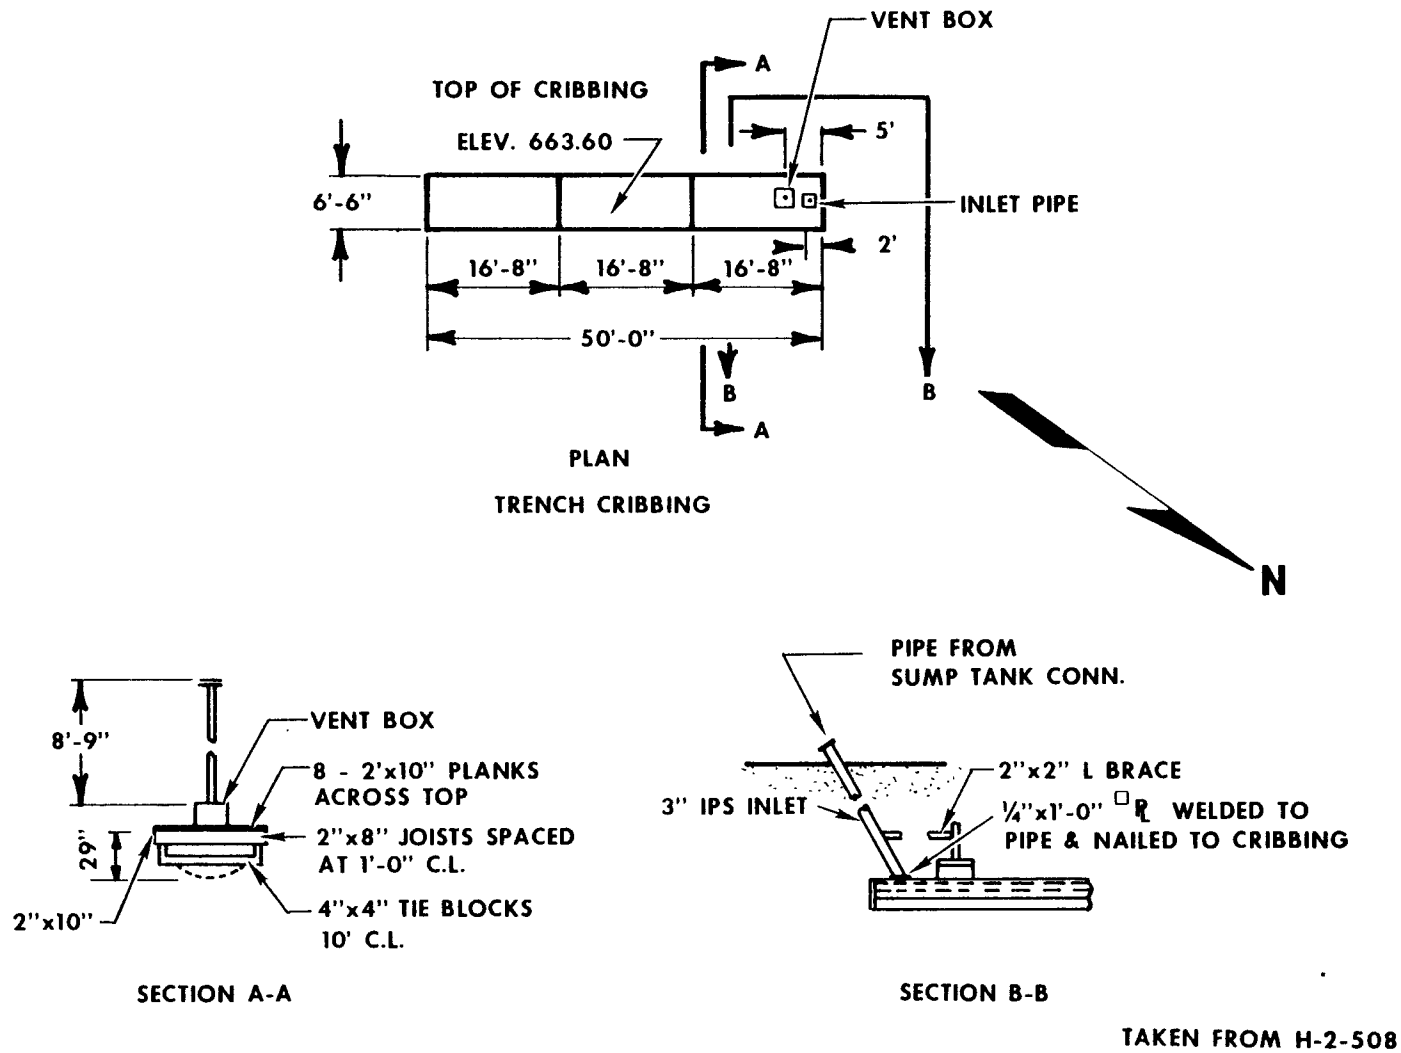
216-Z-6 Crib Plan and Sections. (14)
